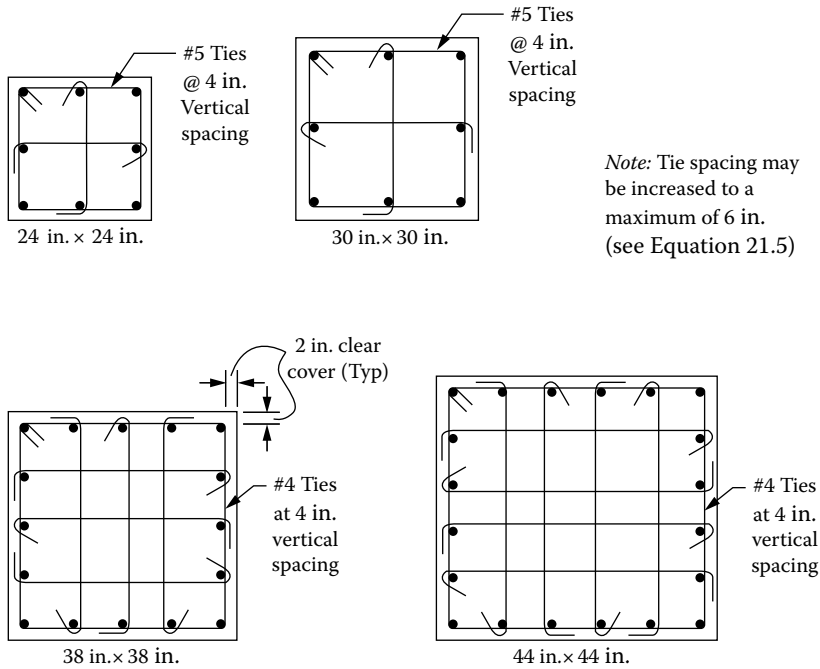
Frame column: detailing requirements, special moment frame.
